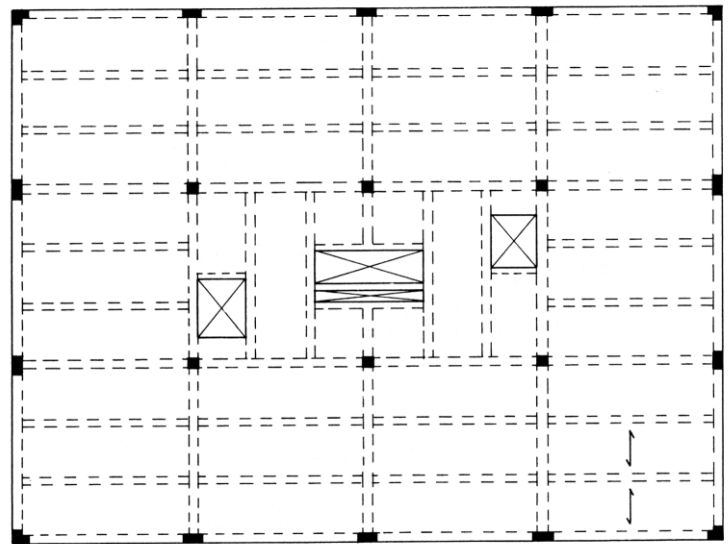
Building Five: Framing plan for the concrete structure for the upper floor.
